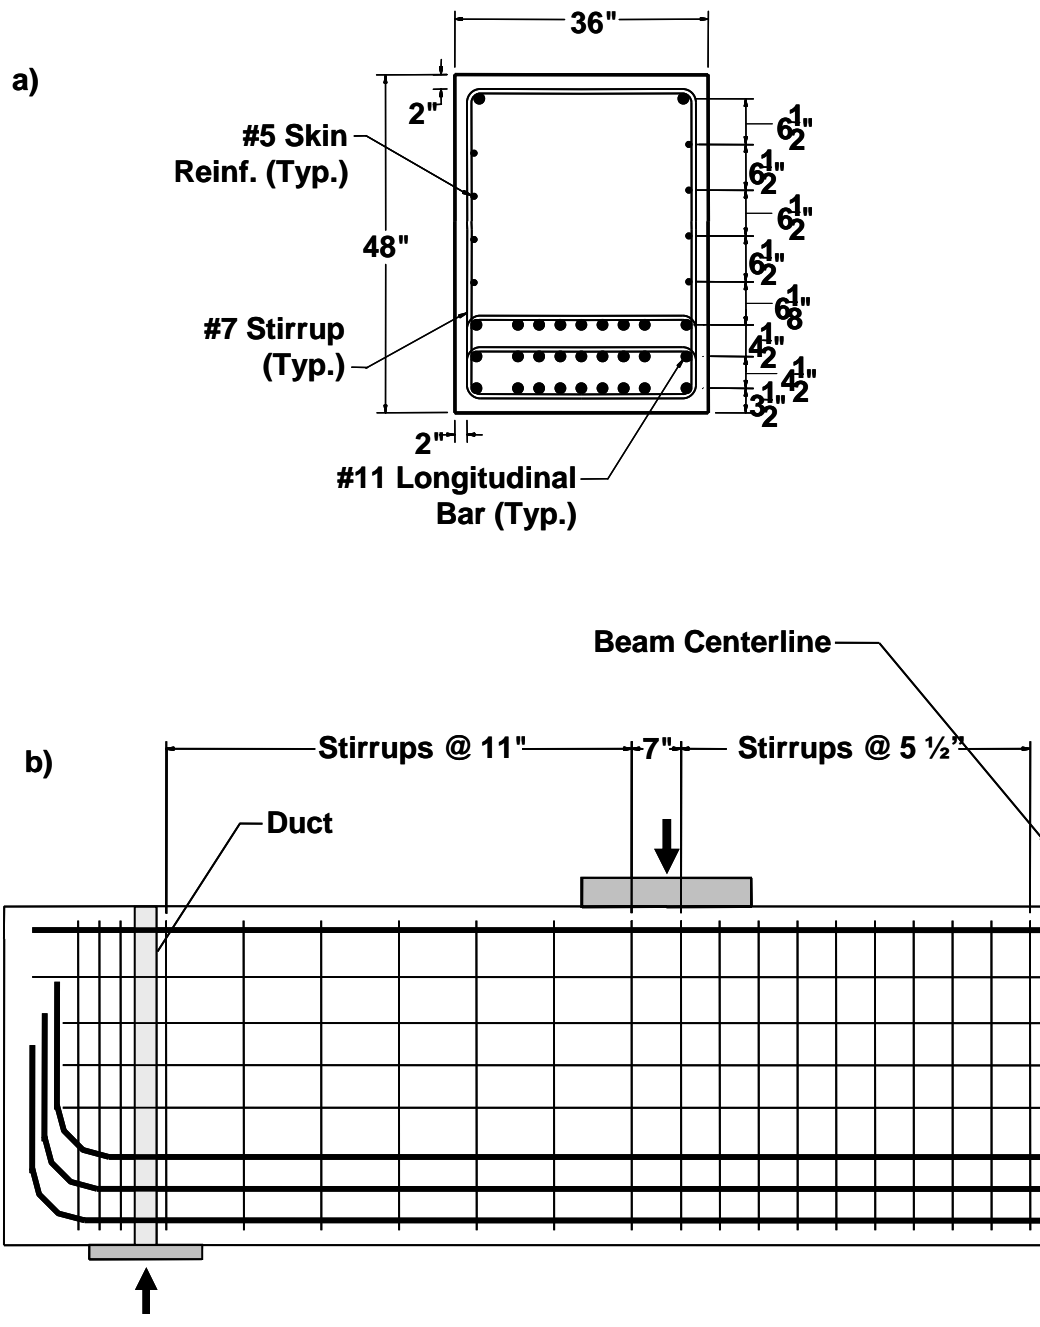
Shear span 2A a) Cross-section; b) Elevation
